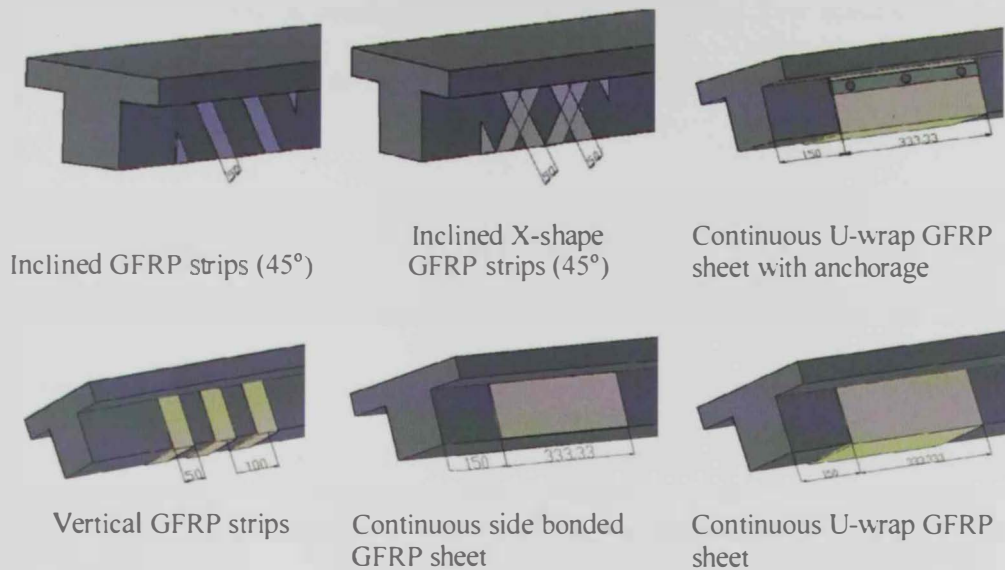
Externally bonded GFRP sheets/strips configurations
